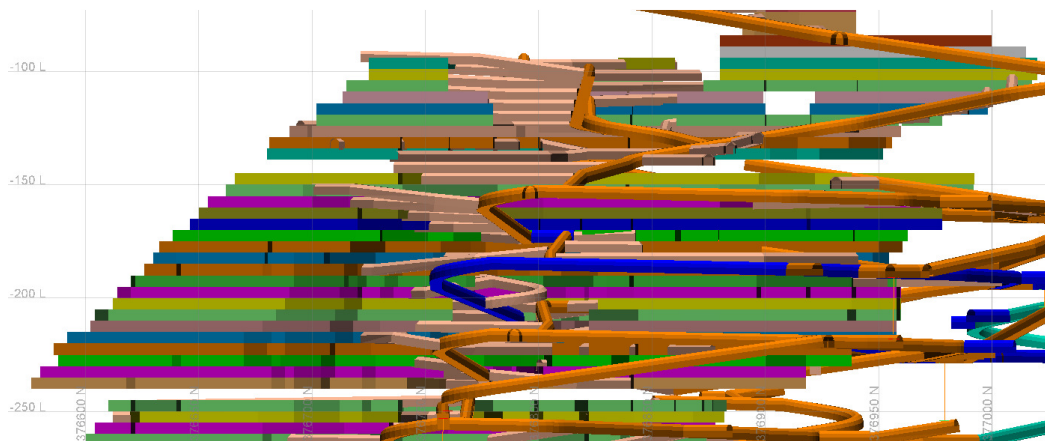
Typical level development showing multiple districts and flitches: looking down, south and west.
